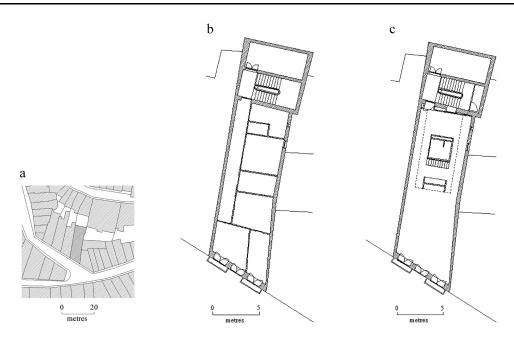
Floor-plan transformation. (a) Location plan. (b) Floor plan before transformation. (c) Floor plan after transformation.
